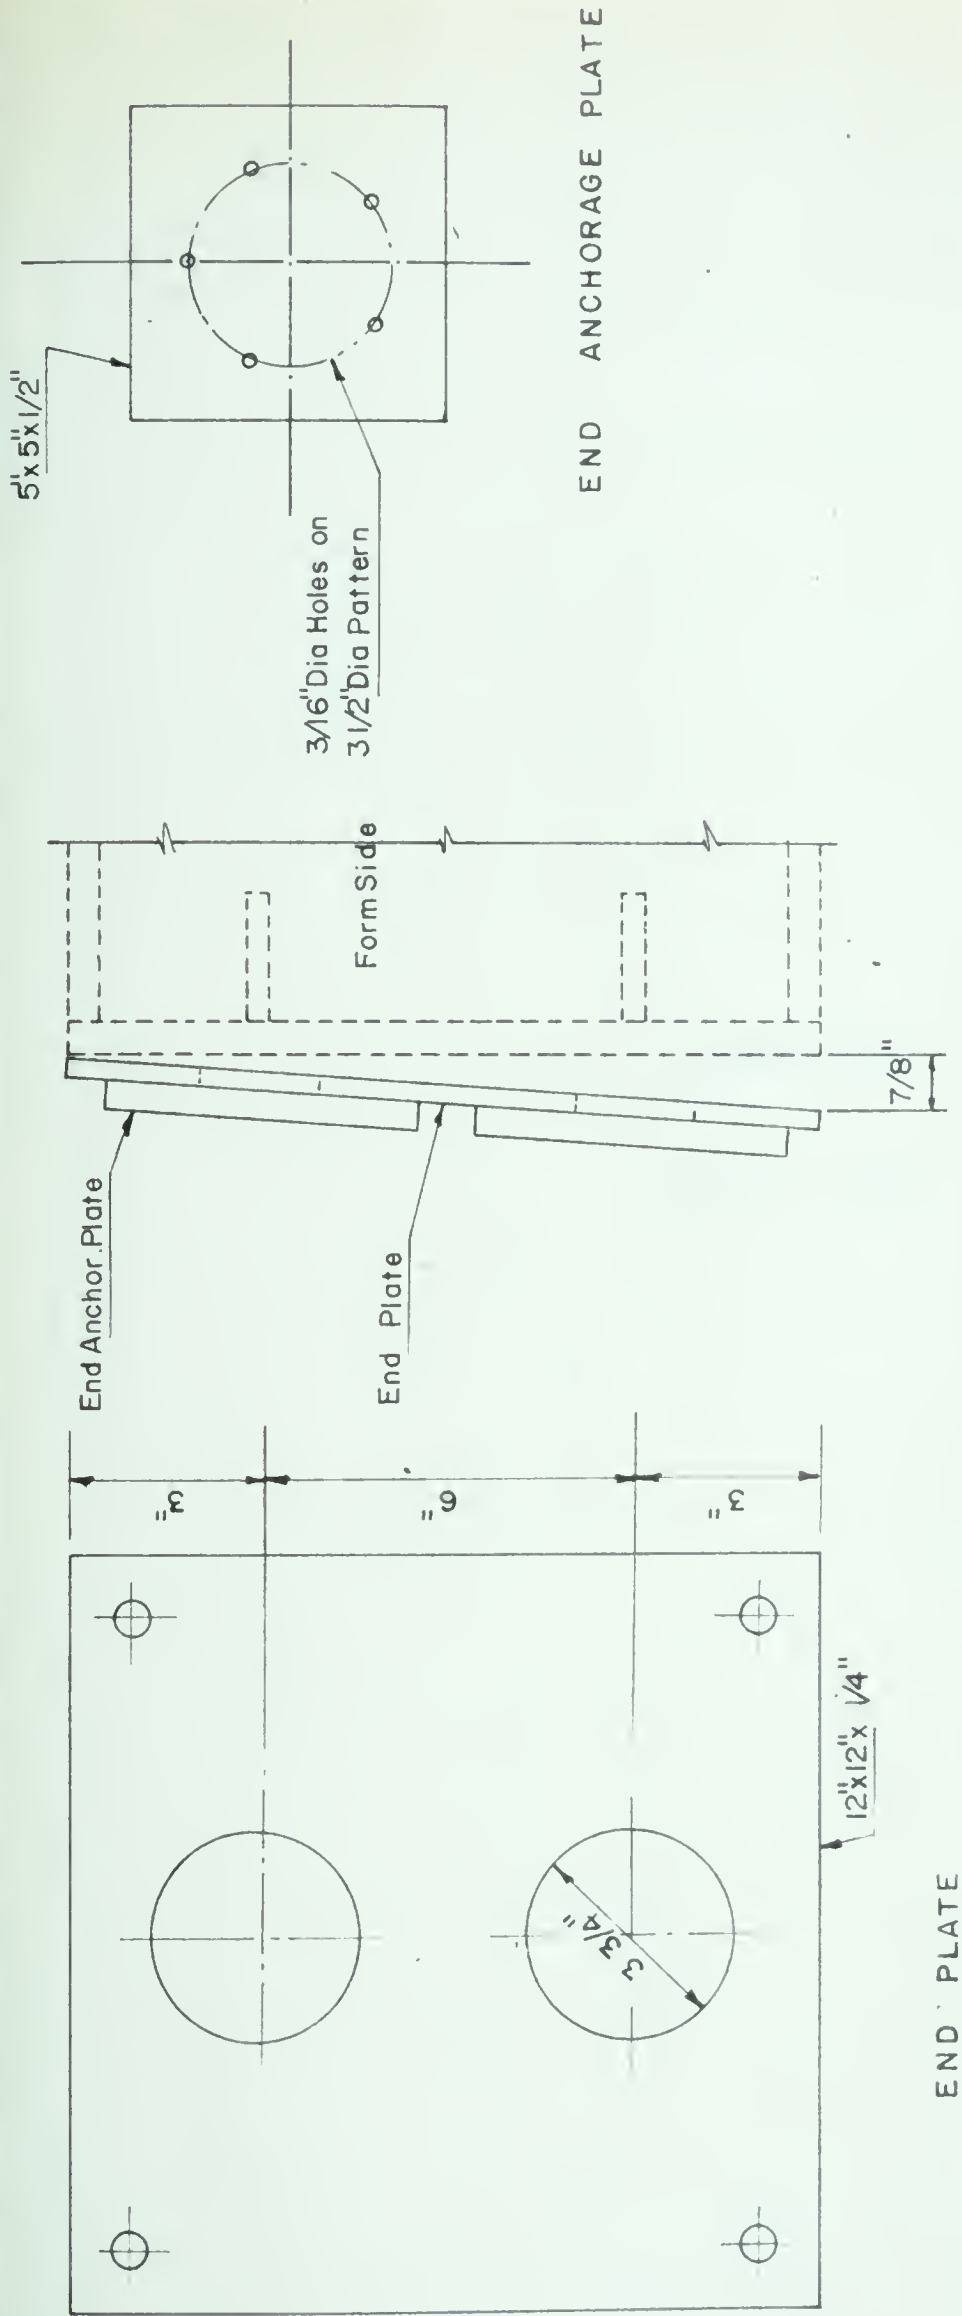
CASTING FORM PIECES FOR THE PRETENSIONED BEAM
